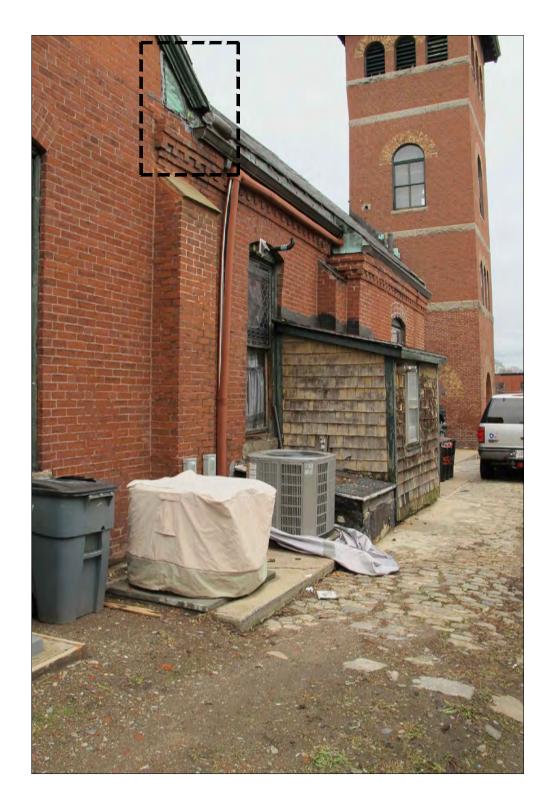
/DRAWING D-200: Missing roof rake return and gutter.
